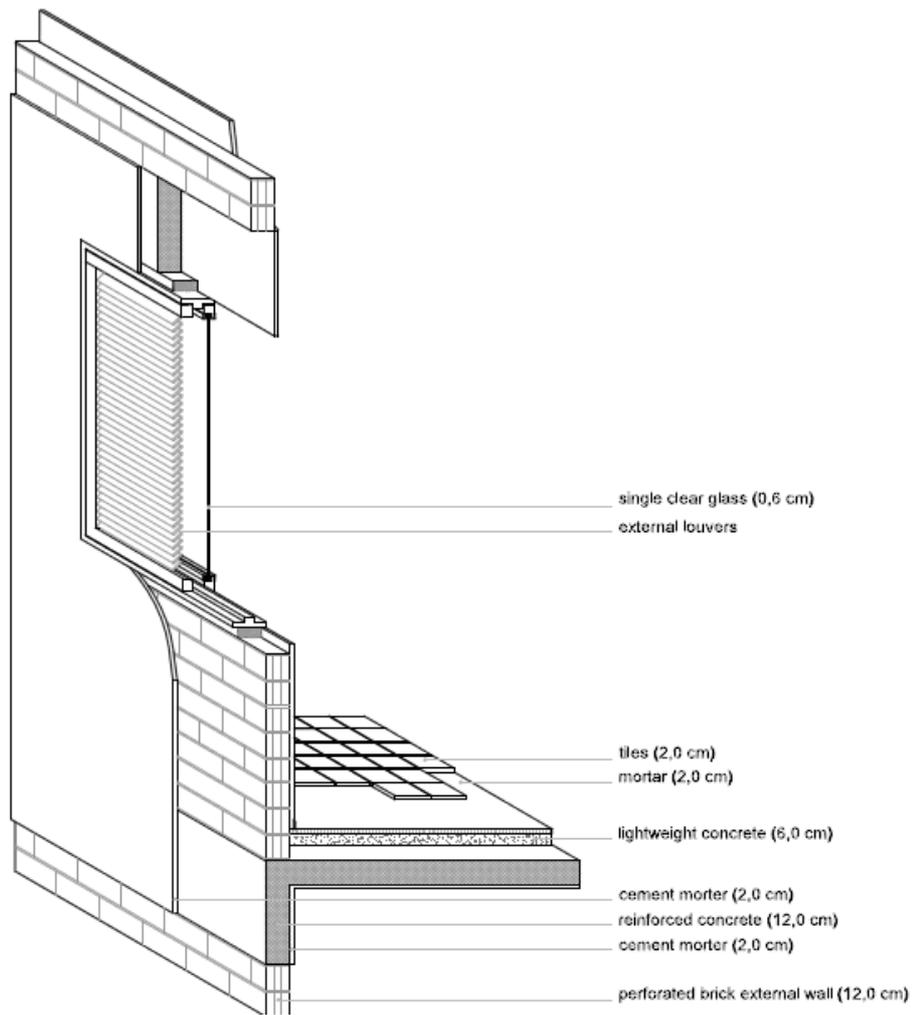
Detail 02 - wall, window and floor connection from outside
